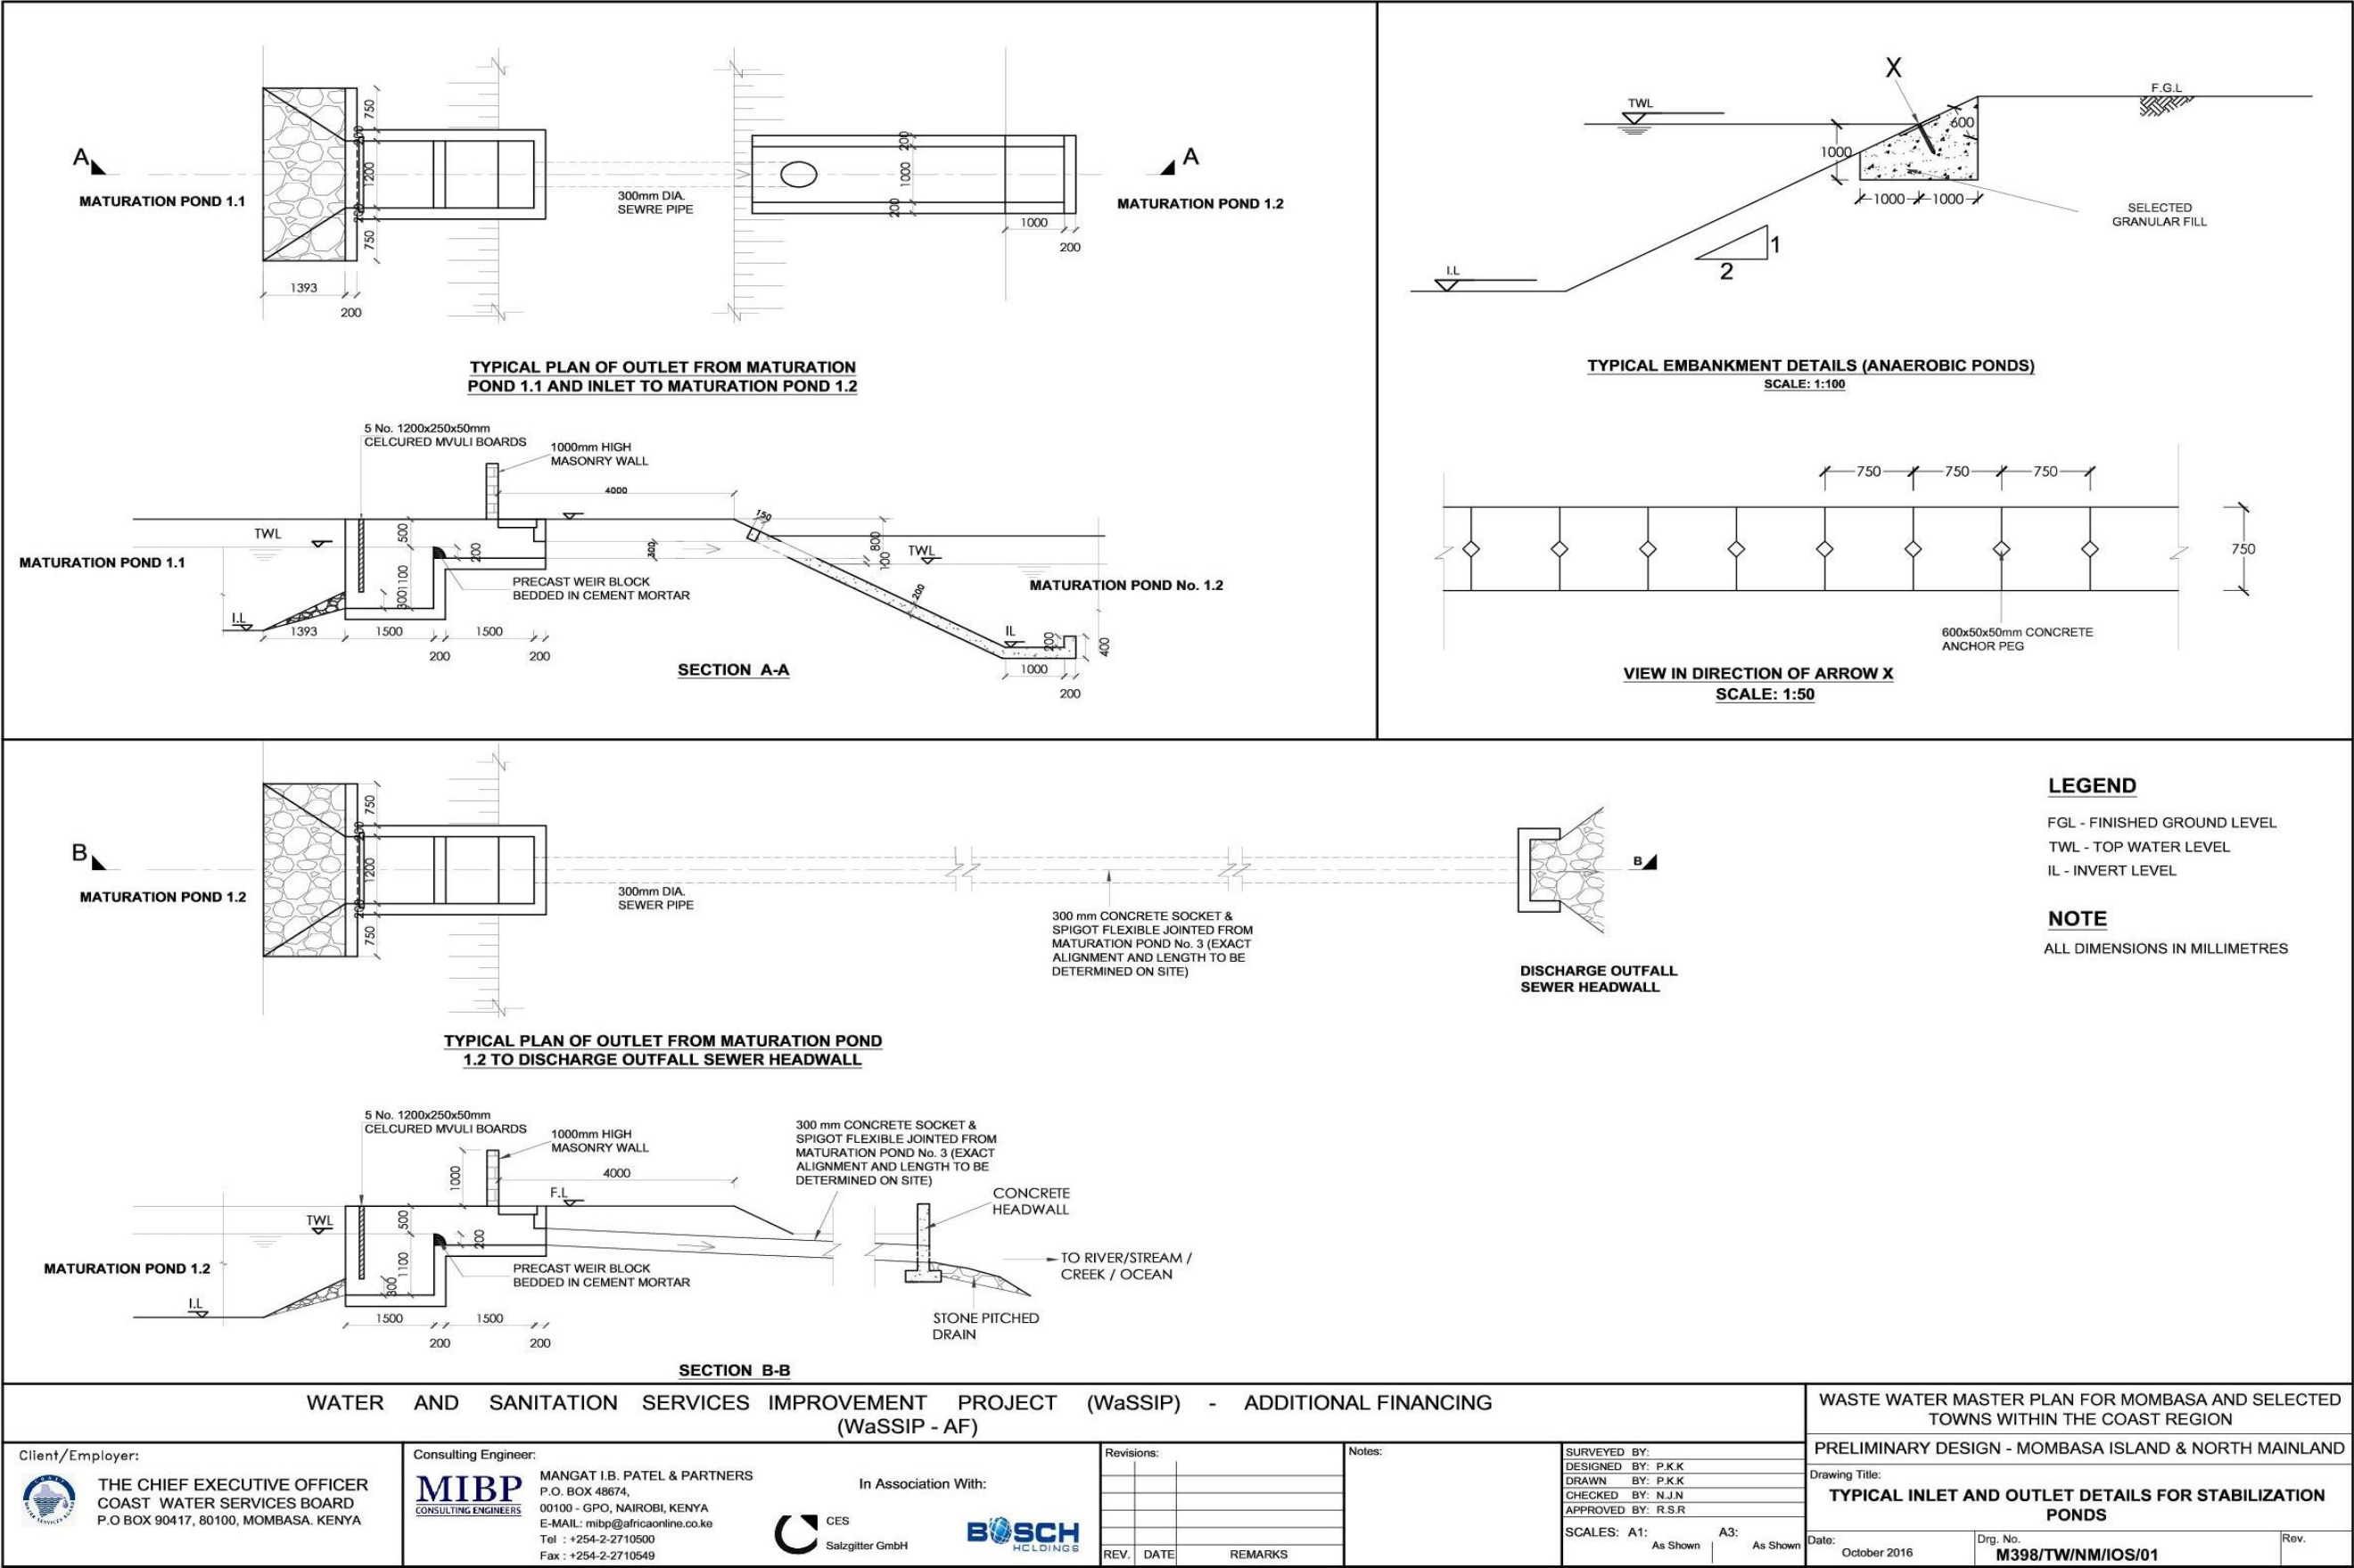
Typical Inlet and Outlet Structures for Waste Stabilization Ponds
